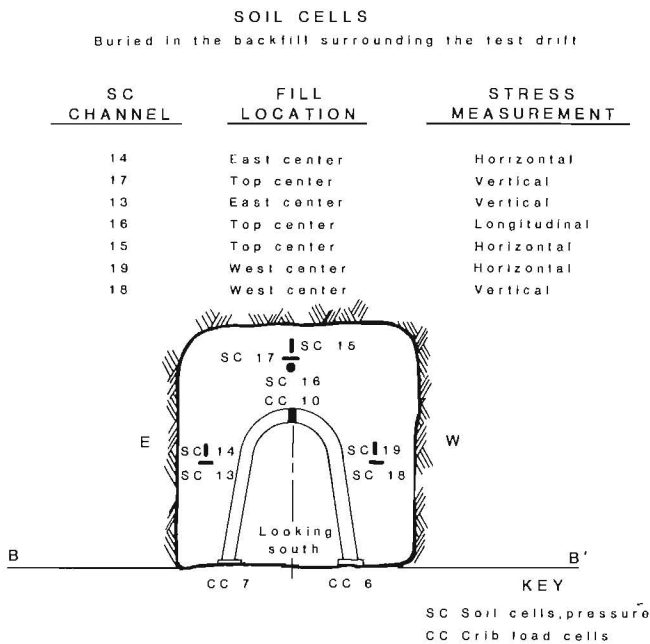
Vertical section B-B' of instrumentation plan, 2315 grizzly level.
